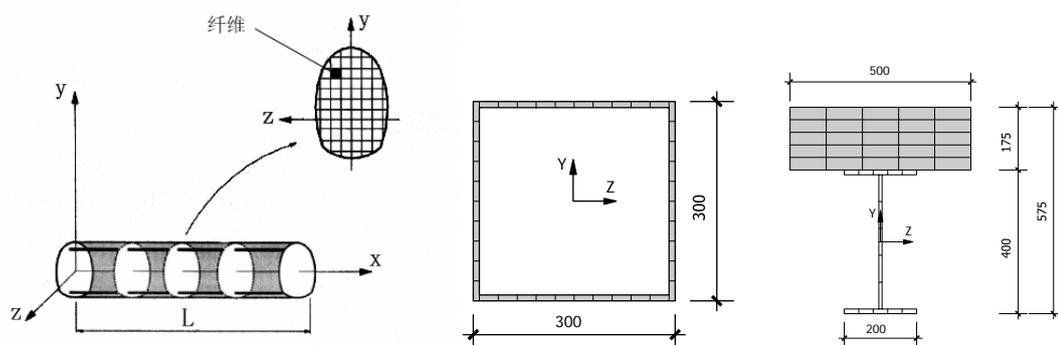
fiber element in local coordinates Figure.5 Fiber Section of Column Figure.6 Fiber Section of Composite Beam
